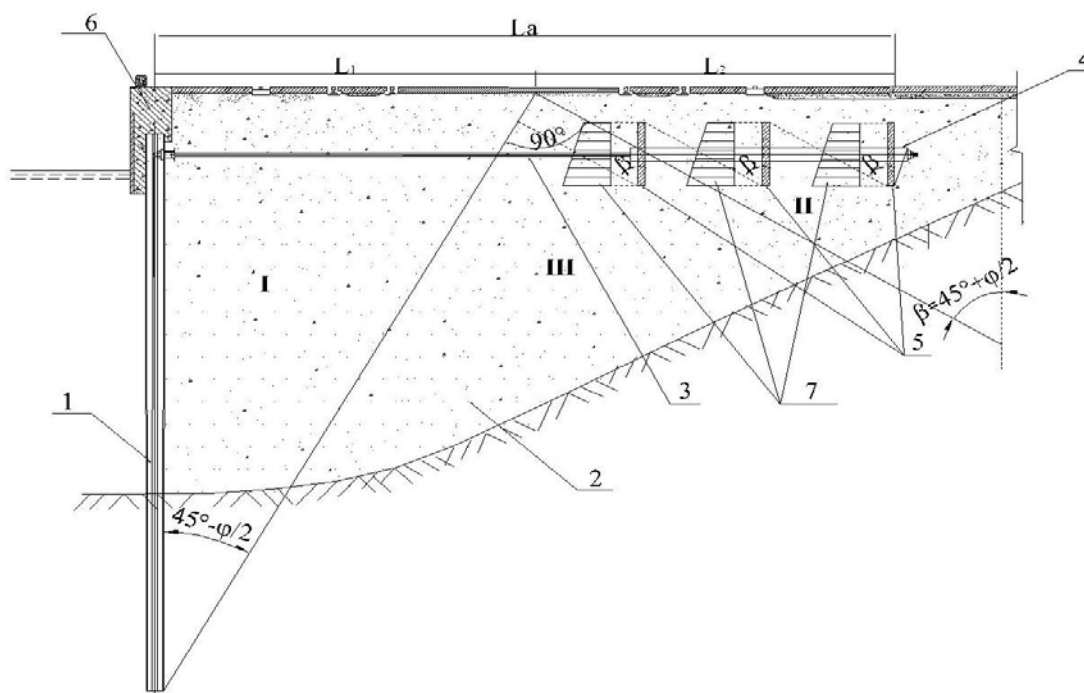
Sheet pile quay wall with anchor bearers of a “comb” type: 1 – sheet piling; 2 – sand filling behind the wall; 3 – tie-rod; 4 – metal core; 5 – anchor plates; 6 – concrete superstructure; 7 – diagrams of soil pressure.
